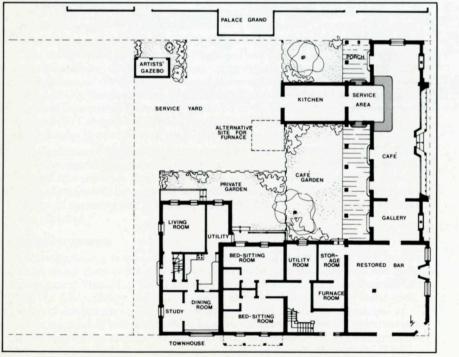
New "Bonanza": Ground (First) Floor and Cafe Infill.
